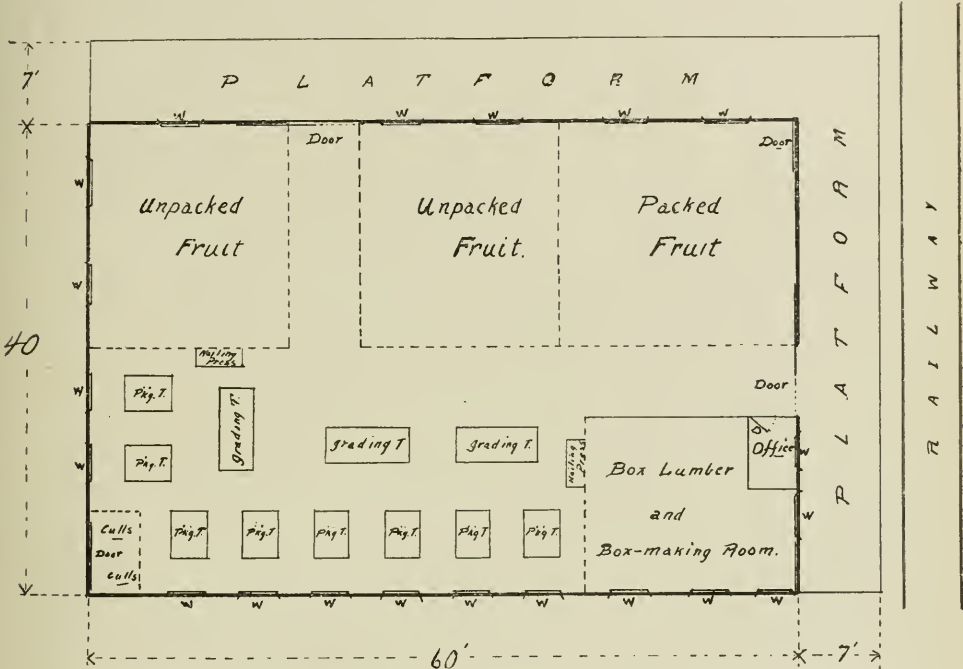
Ground plan of a Packing House, 40' x 60'.
